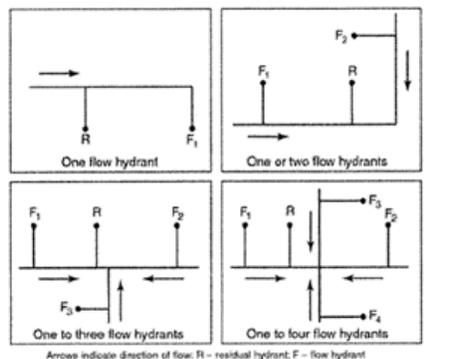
Suggested Test Layout for Hydrants.
